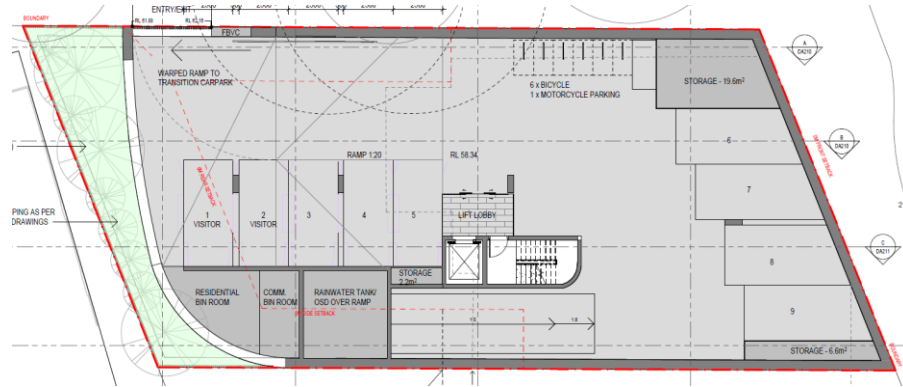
Originally proposed basement 1 floor plan under the subject DA - 18-20A Perouse Road, Randwick (Source: Curzon & Partners)
